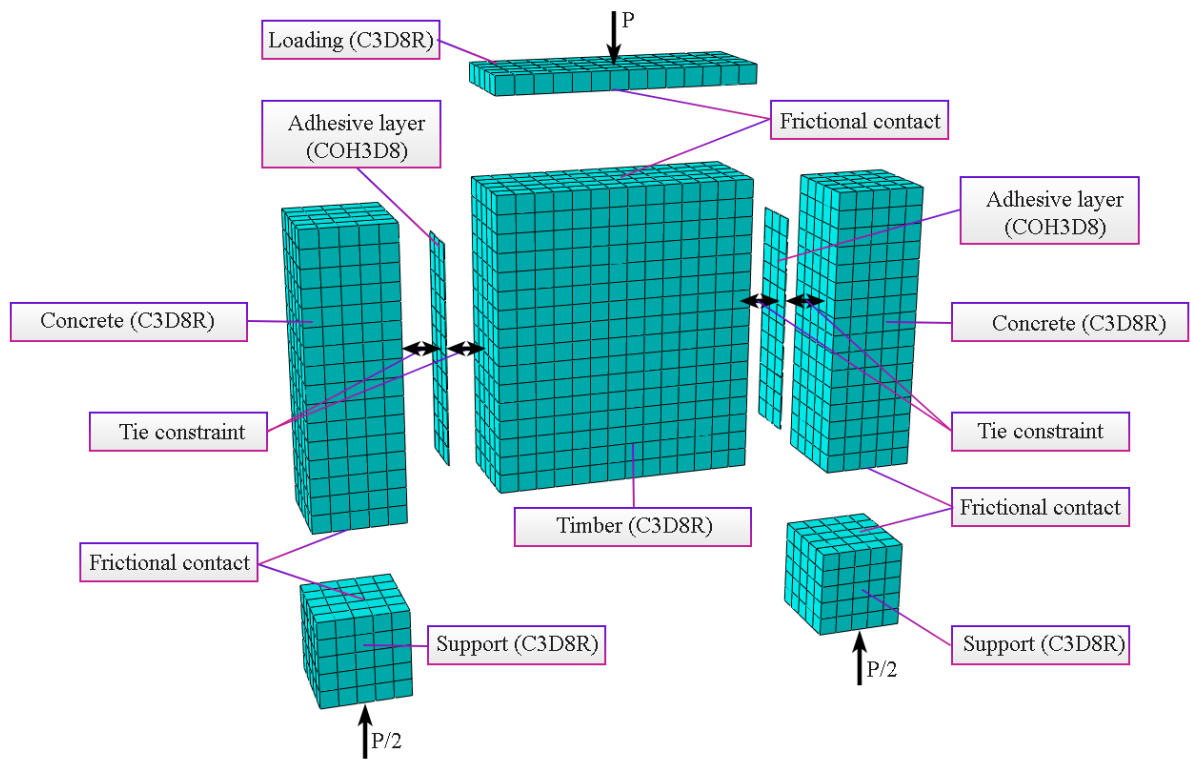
Assembly of the 3D FE model of push-out tests
